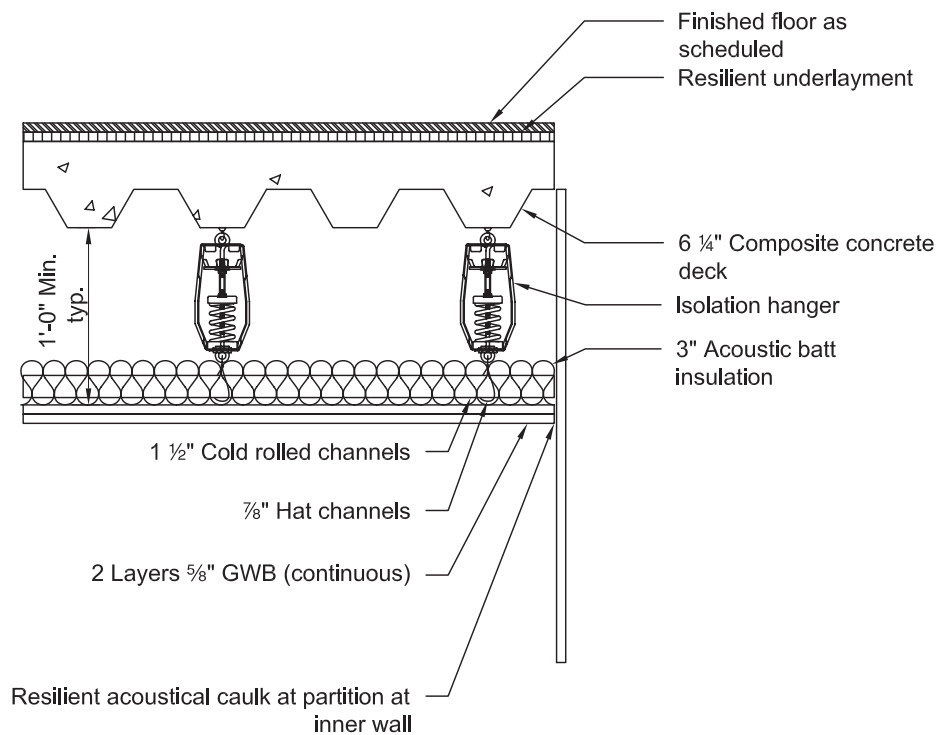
Composite metal/concrete deck with spring ceiling hangers and floors on a resilient underlayment.
